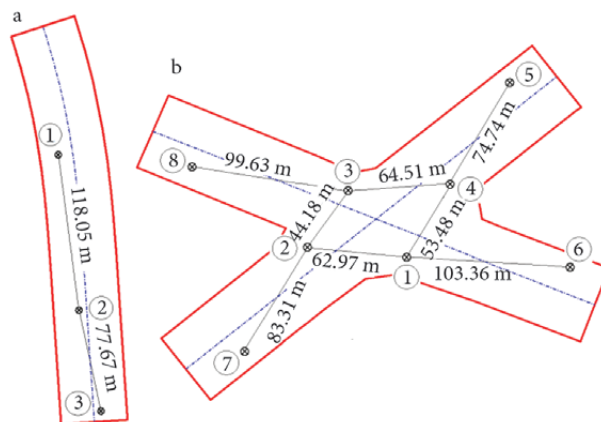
Illustration of the base point scheme: a – section of road No. 130; b – crossroad of Savanorių street and Taikos street in Kaunas
